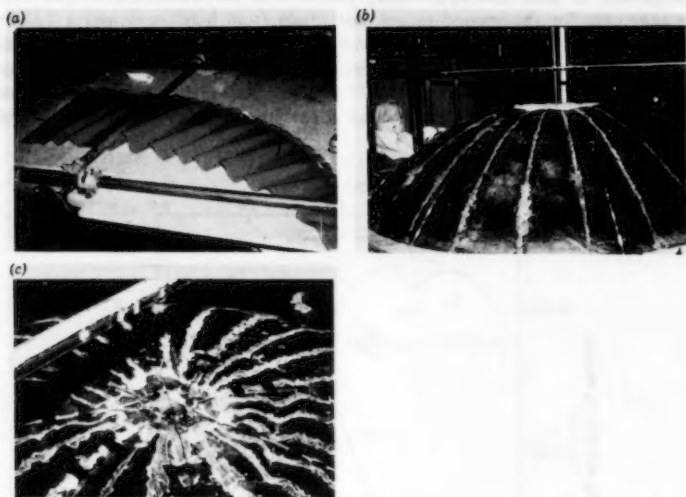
(a) Segment of 0.8 m Radius Dome Clamped in Mold; (b) View of 1.43 m Radius Dome and Loading Arrangement; (c) Meridional Cable System on 1.43 m Radius Dome
